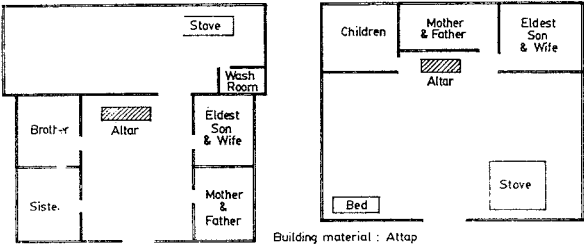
Floor plans of rural Chinese houses in Malaysia (source: Newell, 1962, 102)
